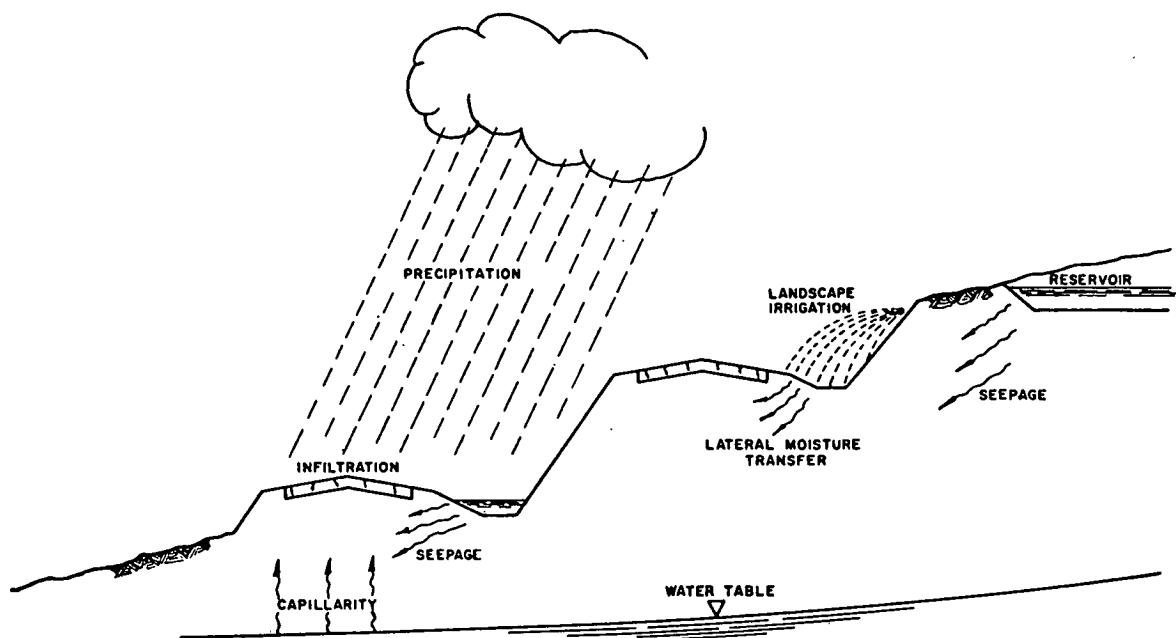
Sources of water entering highway pavement structural sections (10).
